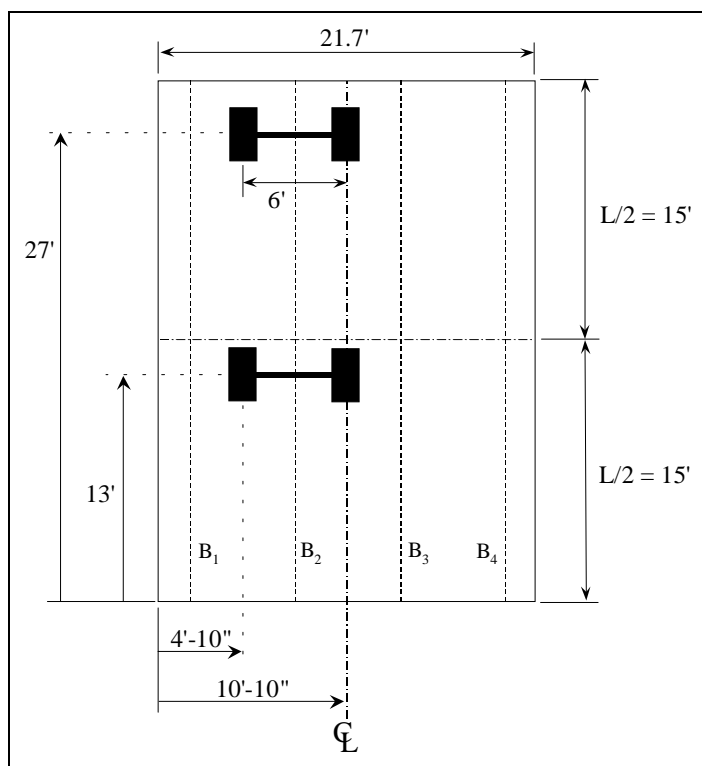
Load case 1 — one asymmetric truck, Wickwire Run Bridge.
